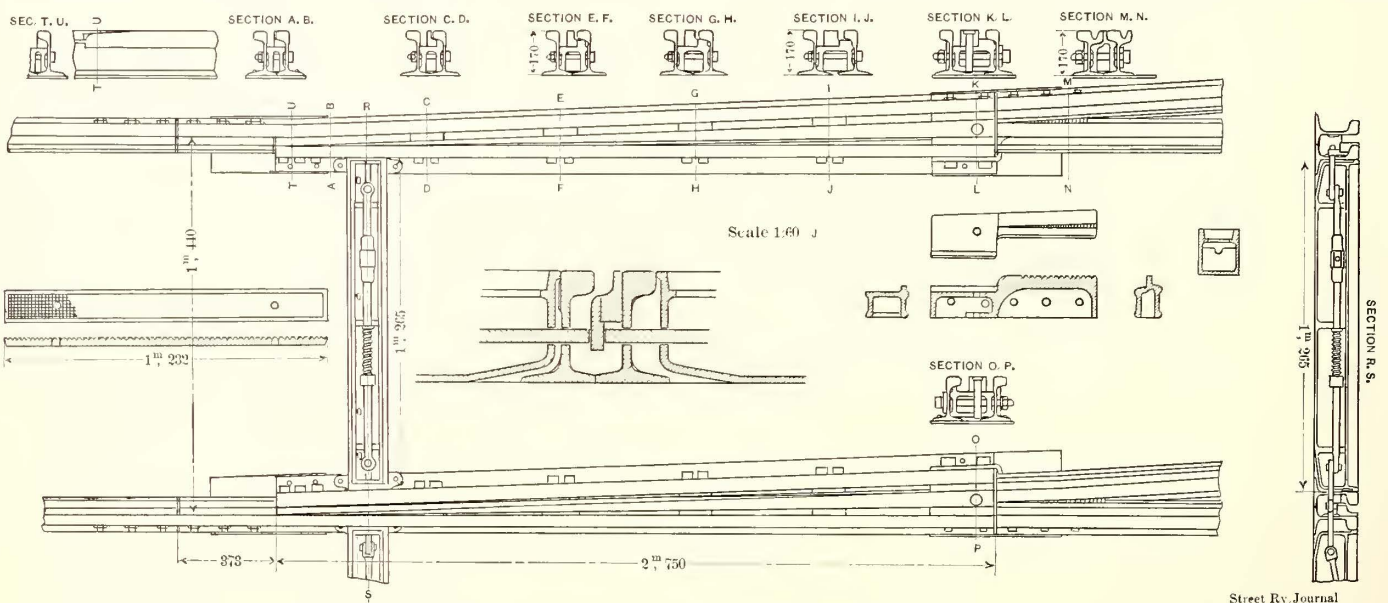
PLAN AND SECTIONS OF TYPICAL FRENCH TONGUE SWITCH
